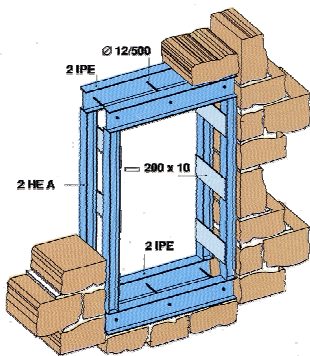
Steel frame used for a wall opening (Mazzolani) [159]
